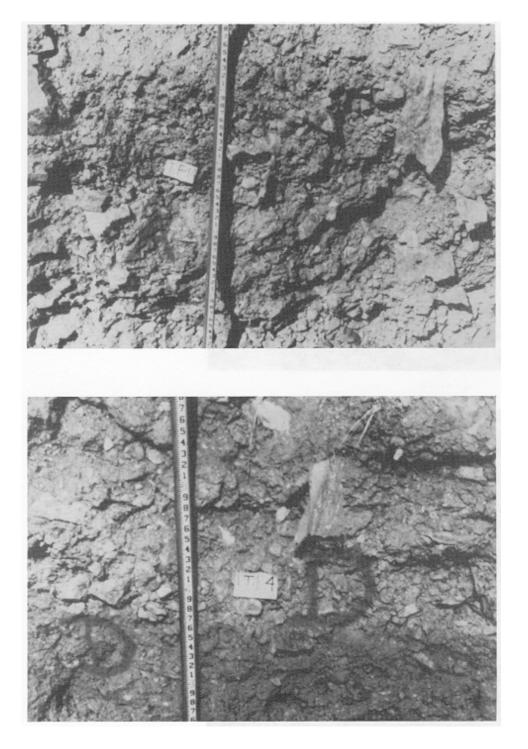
Photographs of rockfill containing appreciable fines, Cerrillos Dam test fill No. 4 inspection trench
